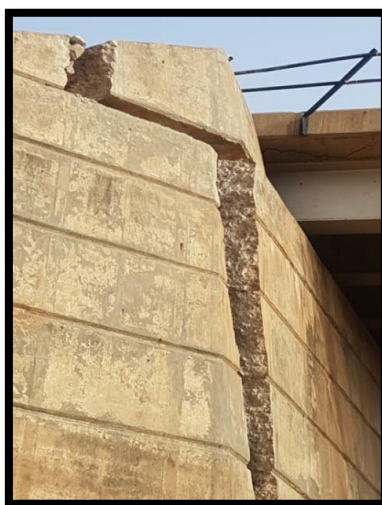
Image Showing Major Vertical Crack on Abutment
